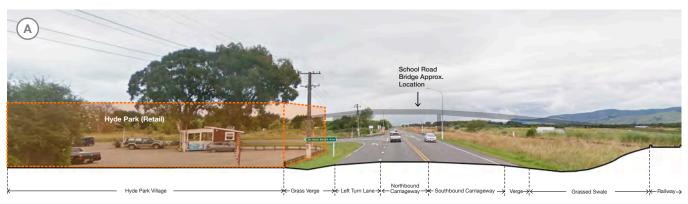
View A - Hyde Park Village, SH1, Te Horo
